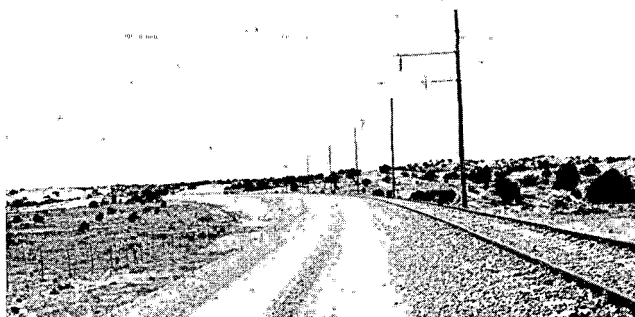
Electrified railroad facility, Black Mesa and Lake Powell Railroad, 50kV, 60 HZ.
